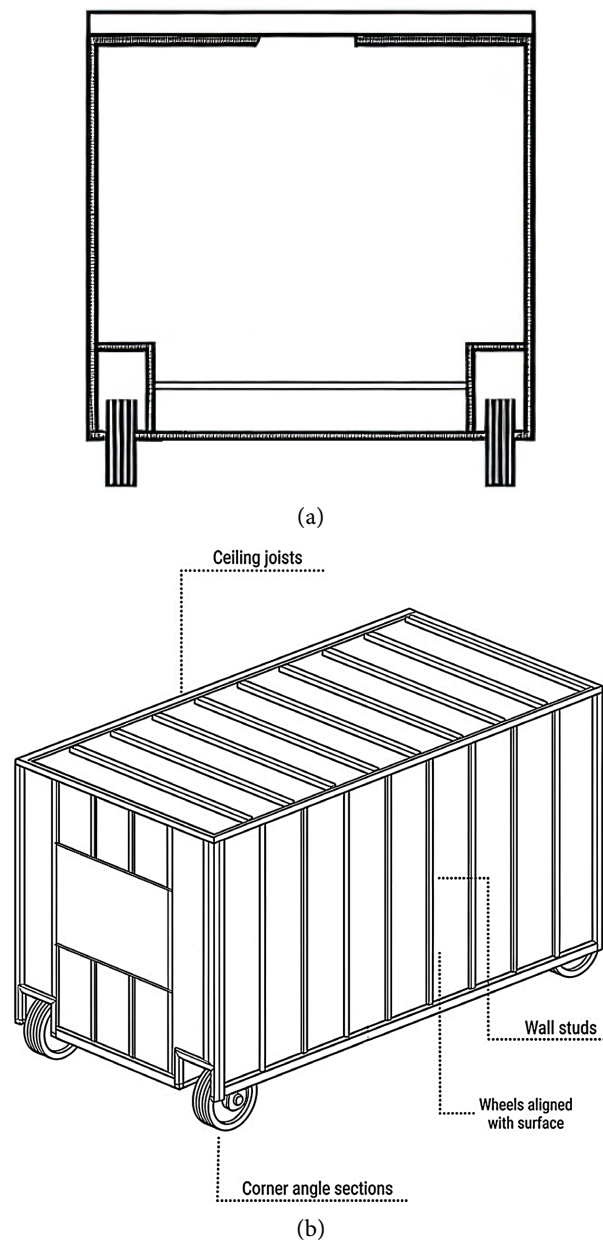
Conceptual section view of a unit with retractable wheels detailing the wheel housing space with wheels extended out (Adapted from [7]). (a) End view; (b) Perspective View.
